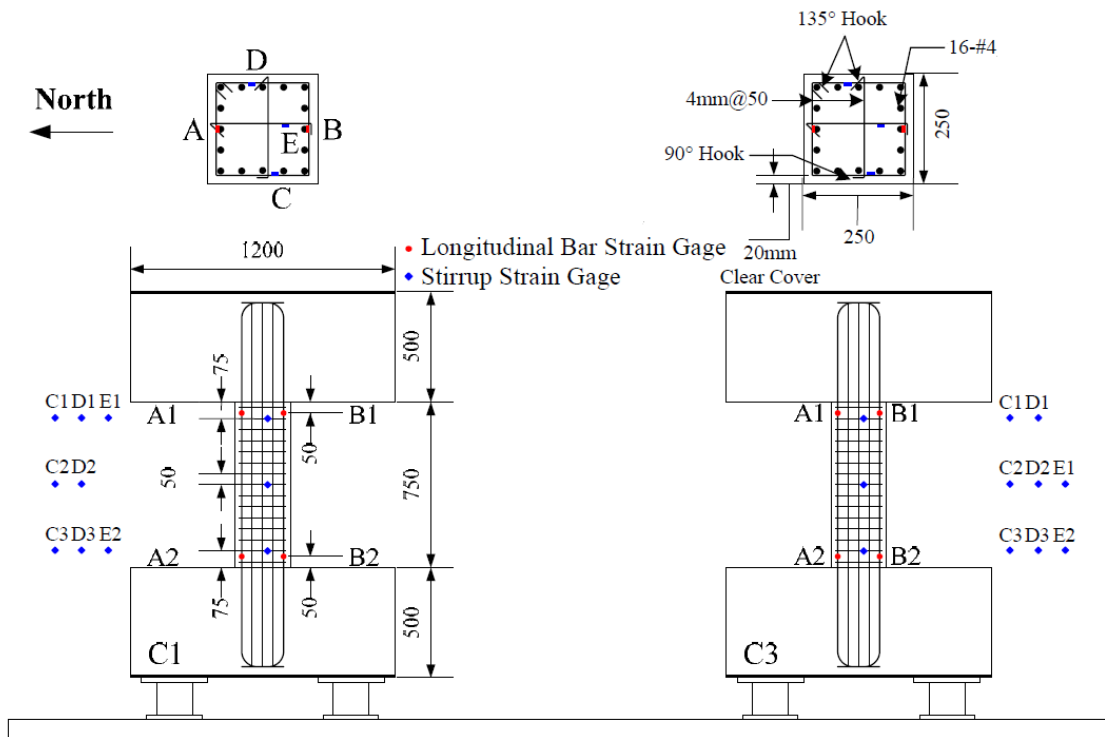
Shaking table test T2 specimen design layout (Su 2007)
